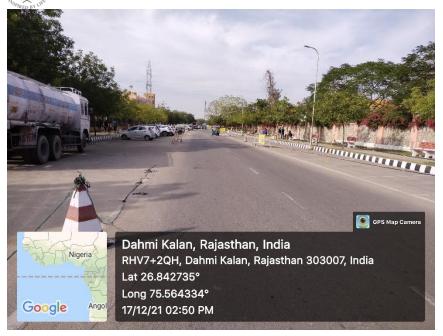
Sidewalks have curb cuts and ramps for individuals with disabilities
